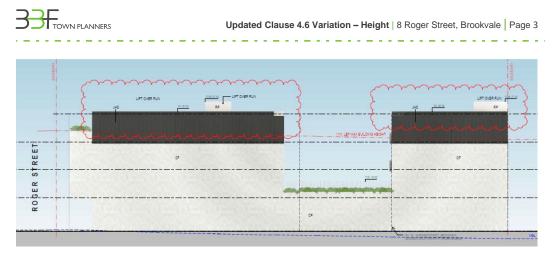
North Elevation by CD Architects with extent of height breach above red line
